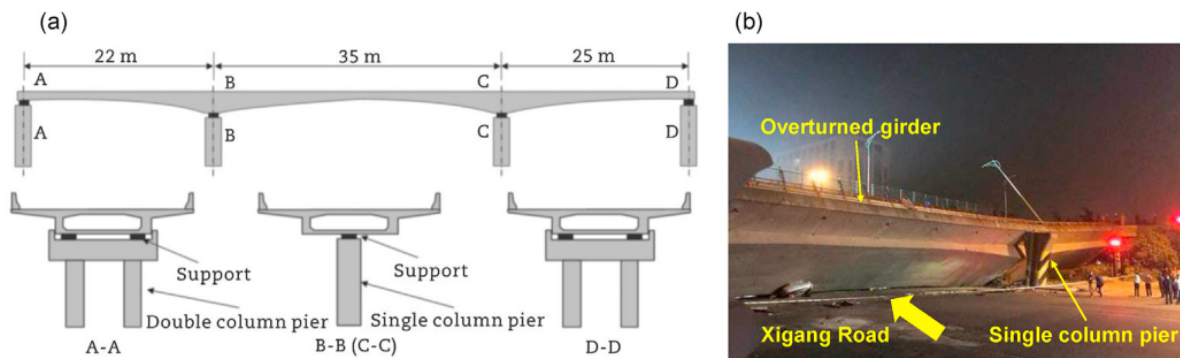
Collapse of Viaduct over Xigang Road. (a) Bridge diagrammatic drawing. (b) Overturned girder.
